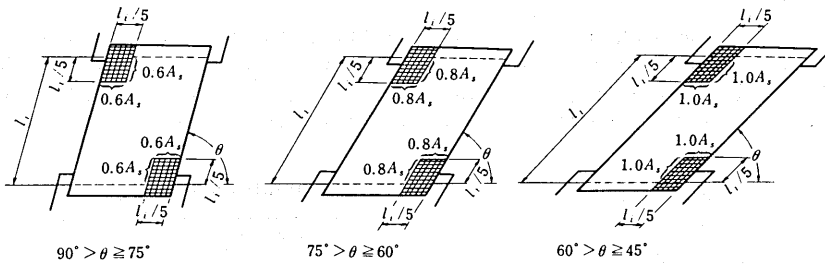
Placing of minimum reinforcement for skewed slabs
